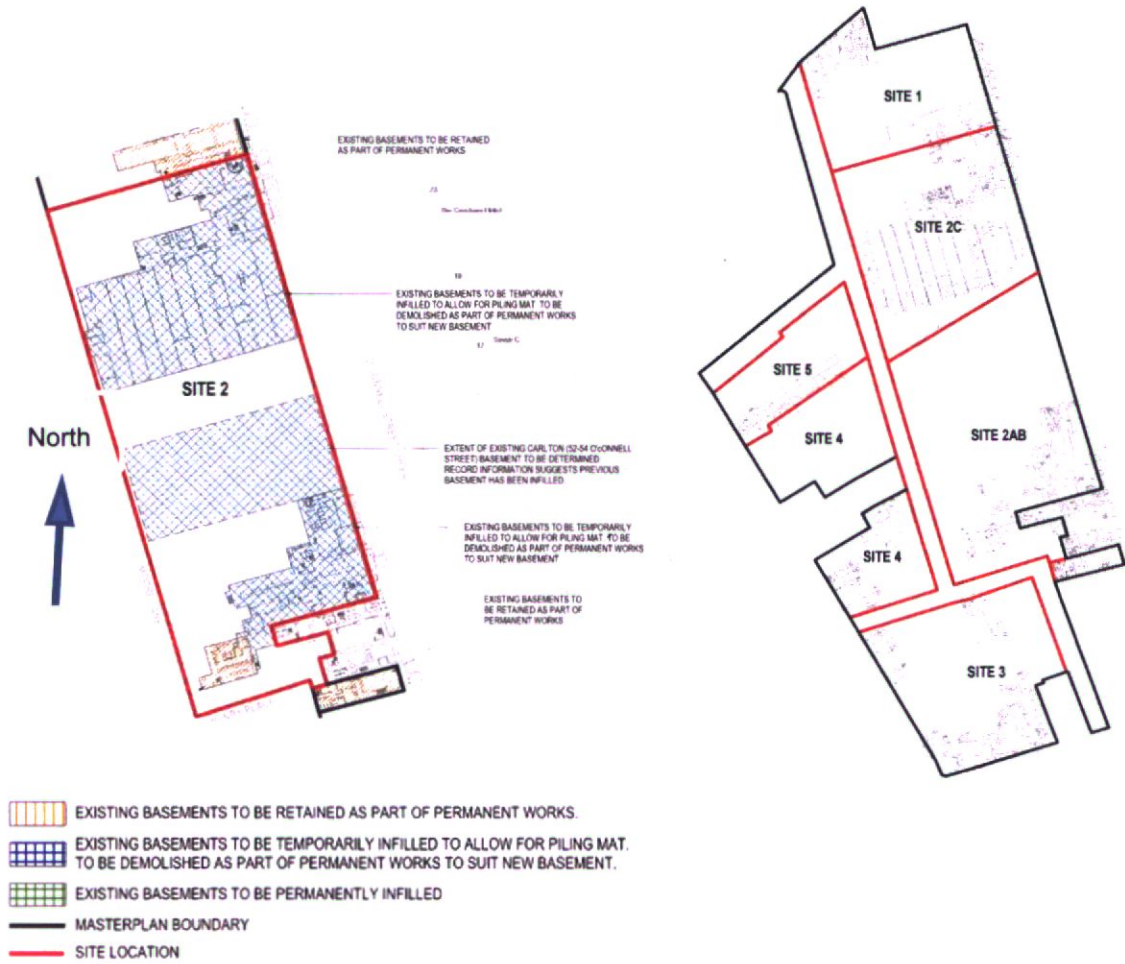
Basement Context Plan and overlay on Murphy survey plan.
